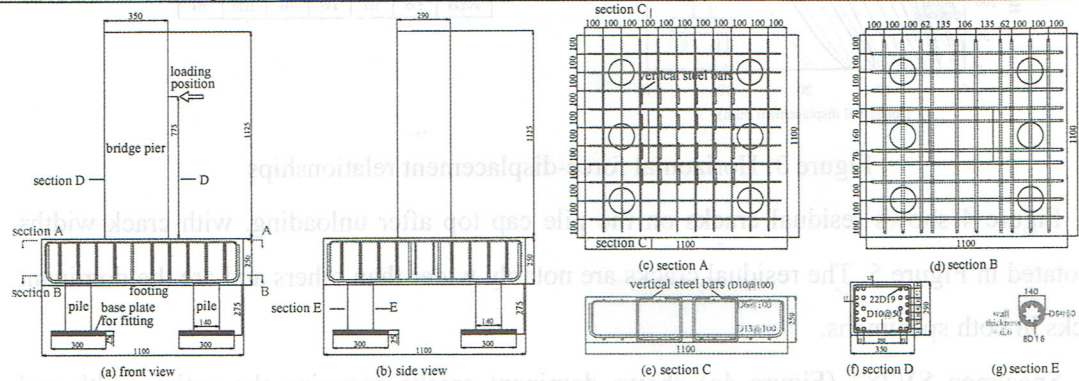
Details of pile cap specimen SV2×3 (unit: mm)
